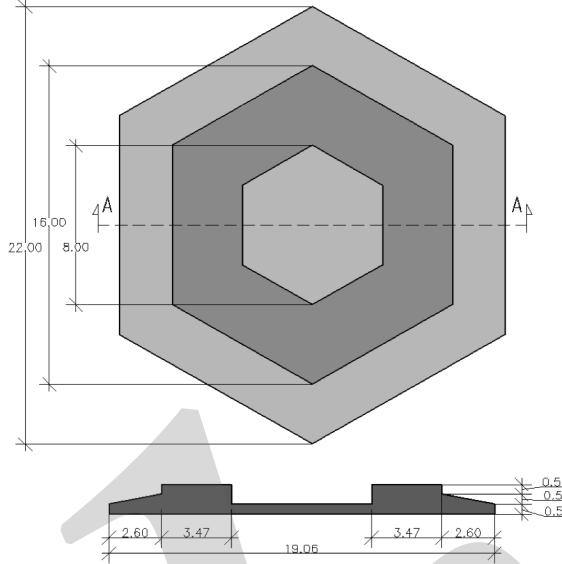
Upper and frontal views of the foundation for the precast concrete tripod for wind tower
